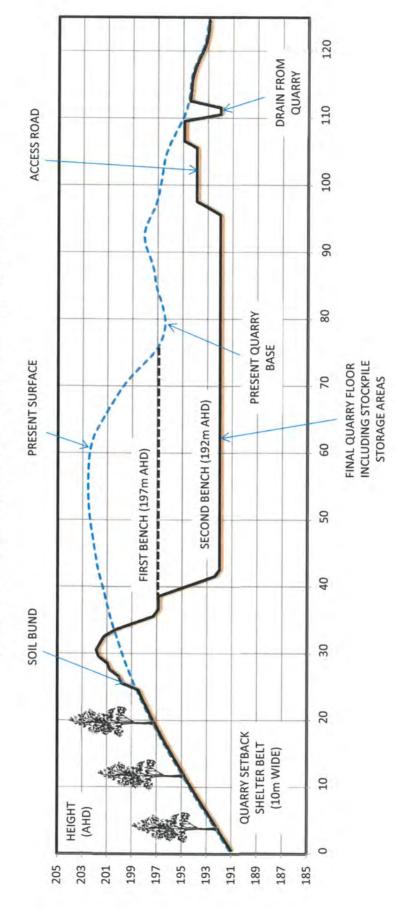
CROSS SECTION OF QUARRY EXTRACTION PLAN
